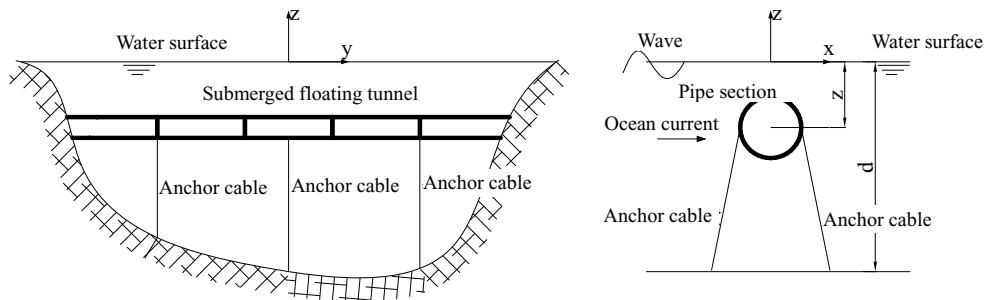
Structure drawing and calculation model of submerged floating tunnel
